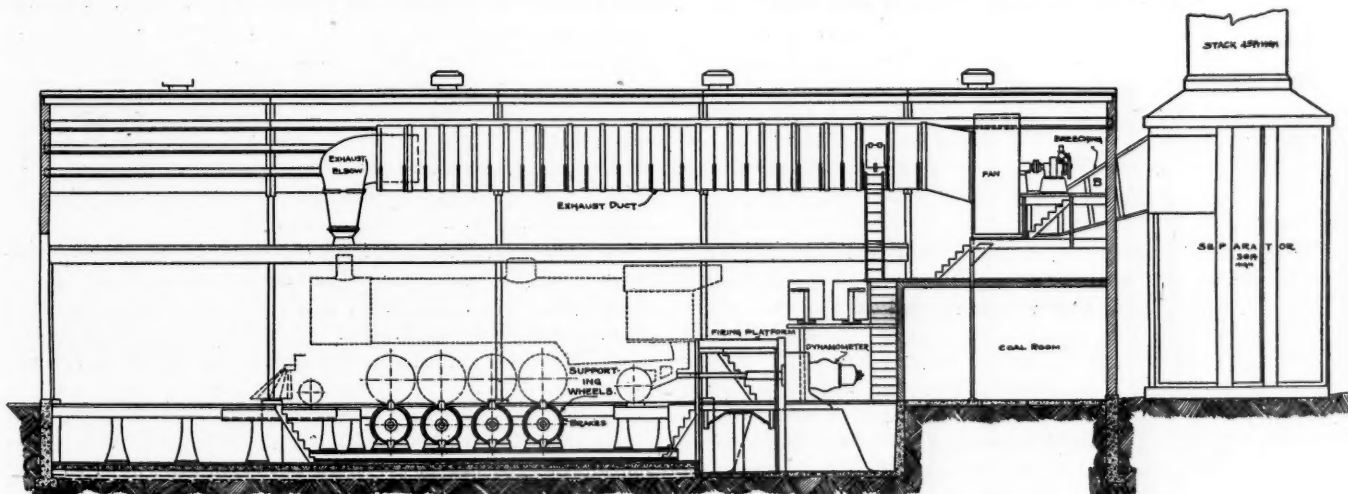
Longitudinal Section Through the Locomotive Testing Laboratory.
